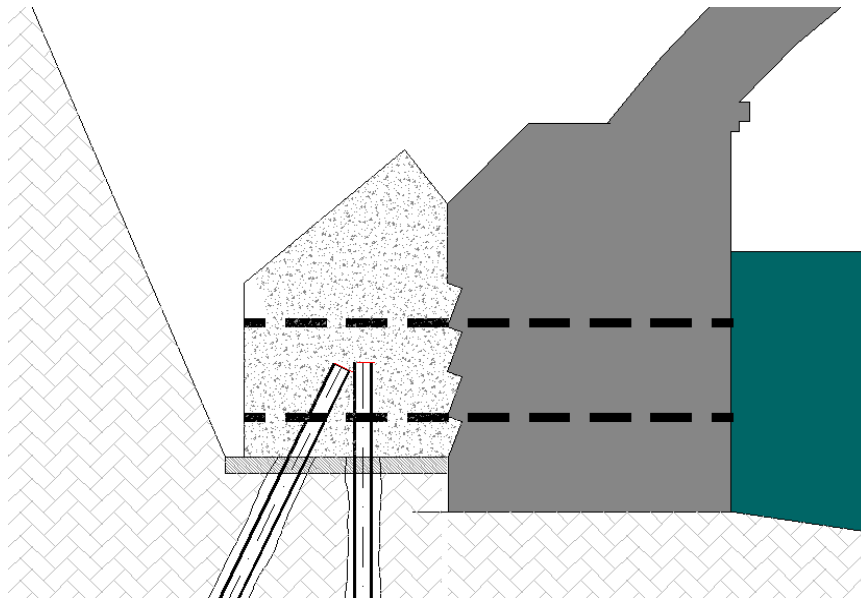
Detail of concrete abutment and micro-piles. (Modena, 2004)
